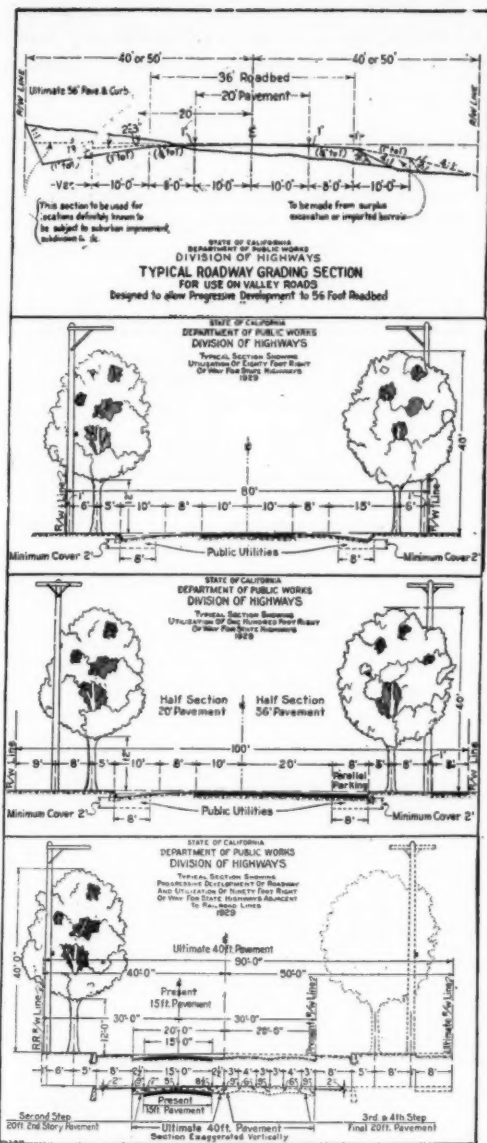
TYPICAL SECTION FOR VALLEY ROADS
